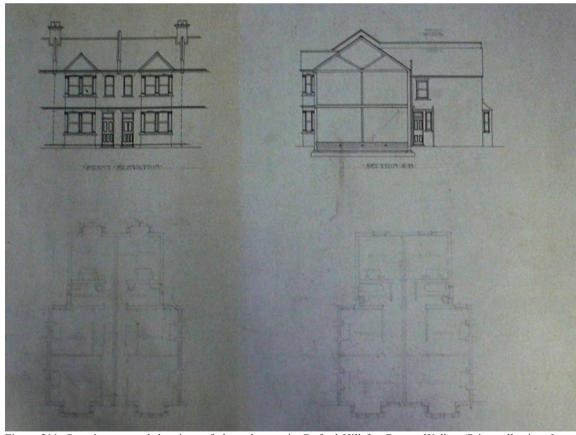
Stone's proposed drawings of above houses in Catford Hill for George Walker (Prior collection, Item 1553)
